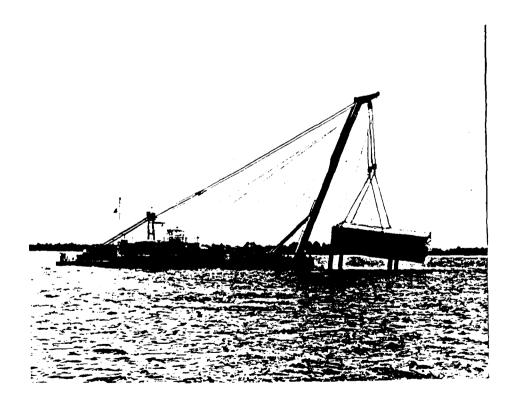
Photo of Section 1 Being Transported to the Bay (Note that sections were lowered with legs in the water during towing to reduce dynamic loads in the bridals)
